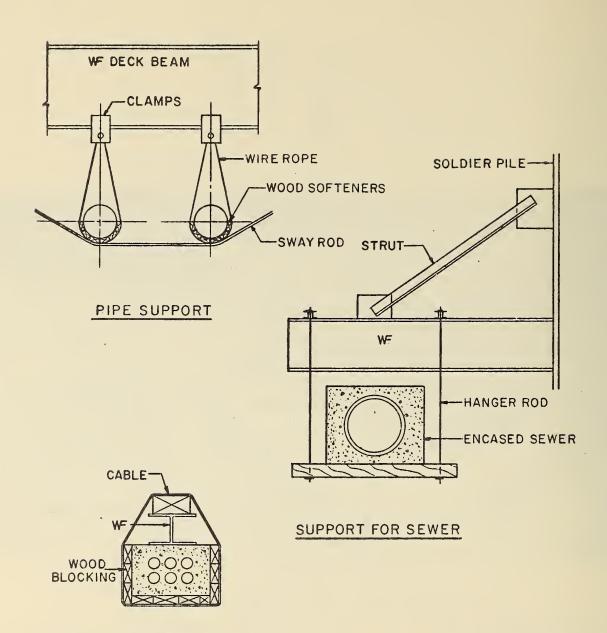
UTILITIES CROSSING CONSTRUCTION METHOD
